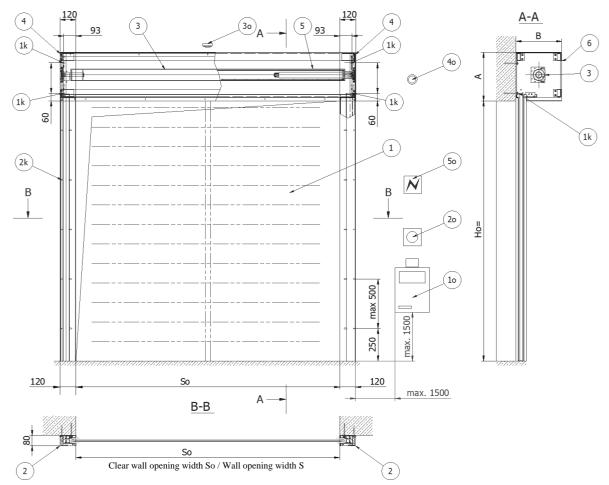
Direct wall-mounted installation conditions for a standard fire safety curtain door
